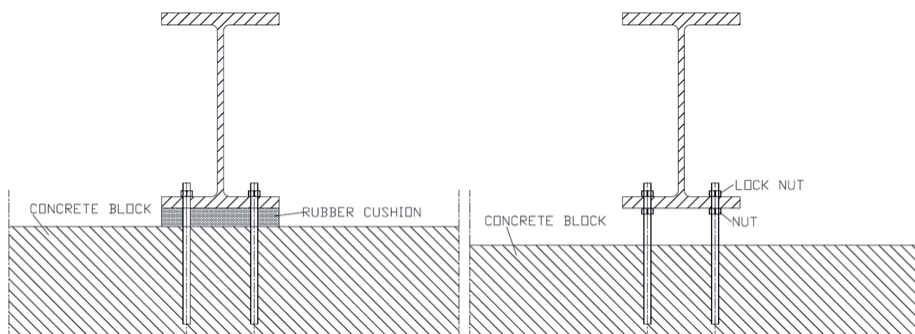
Support of bridge beam at an abutment during construction.. Threaded rods are used to fix the beam to the abutment. In the left figure the bridge beam sits on a rubber cushion and on the right beam sits on nuts threaded onto the rod.
